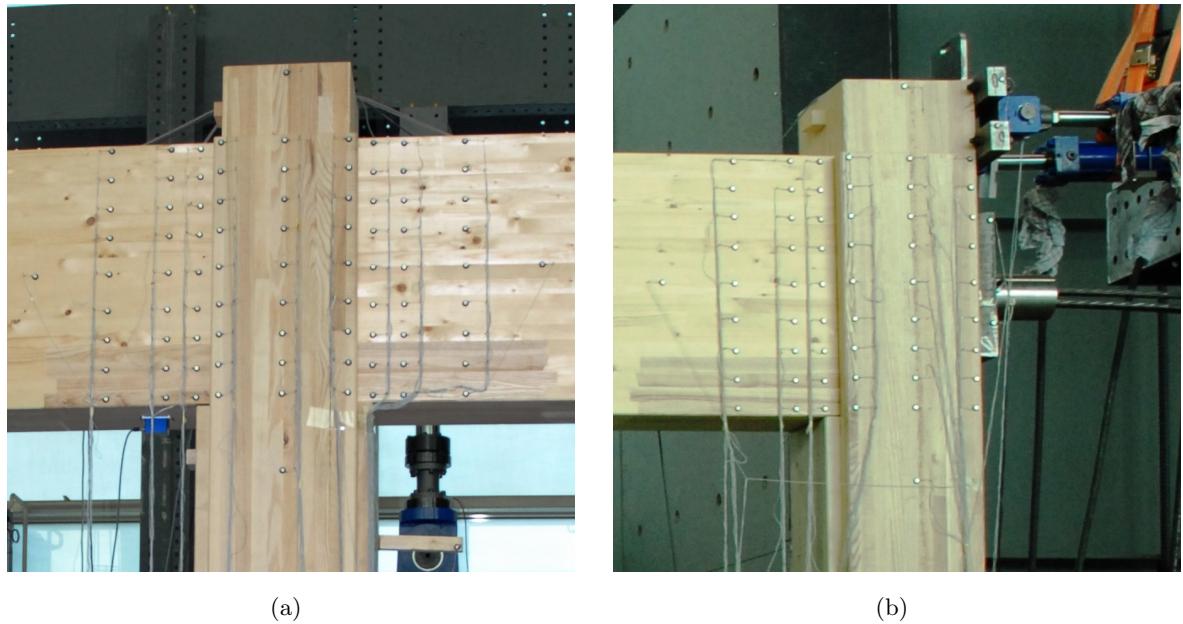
2.5(a): Column-base plate 2.5(b): Steel elements for lateral reinforcement of the test setup
